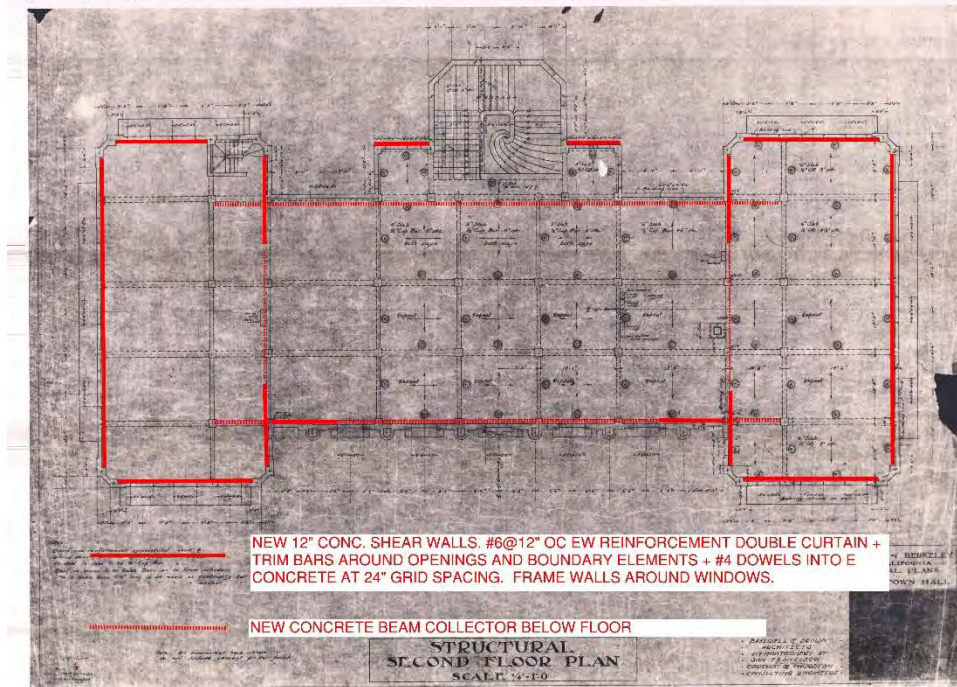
Seismic Retrofit Scheme (Concrete Shear Walls) at Second Floor
